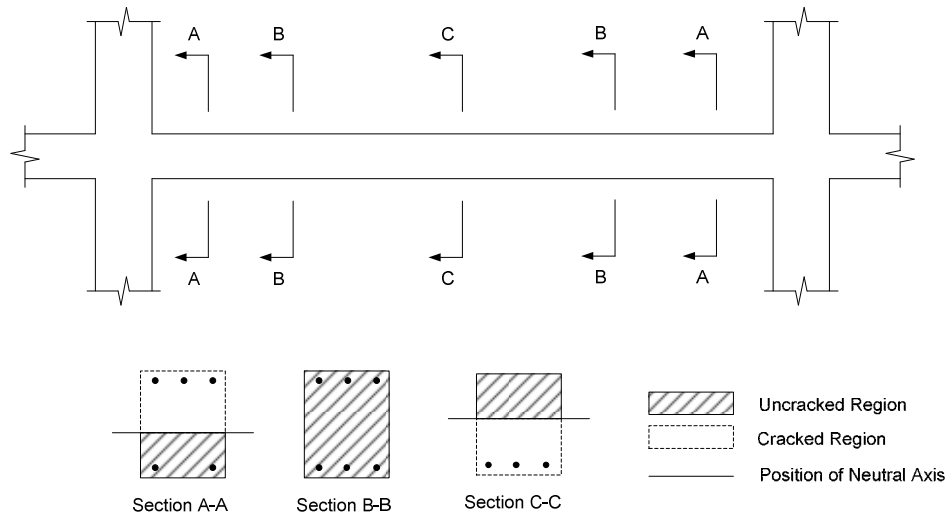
Limiting Effective Sections for a Continuous Beam (Branson, 1977)
